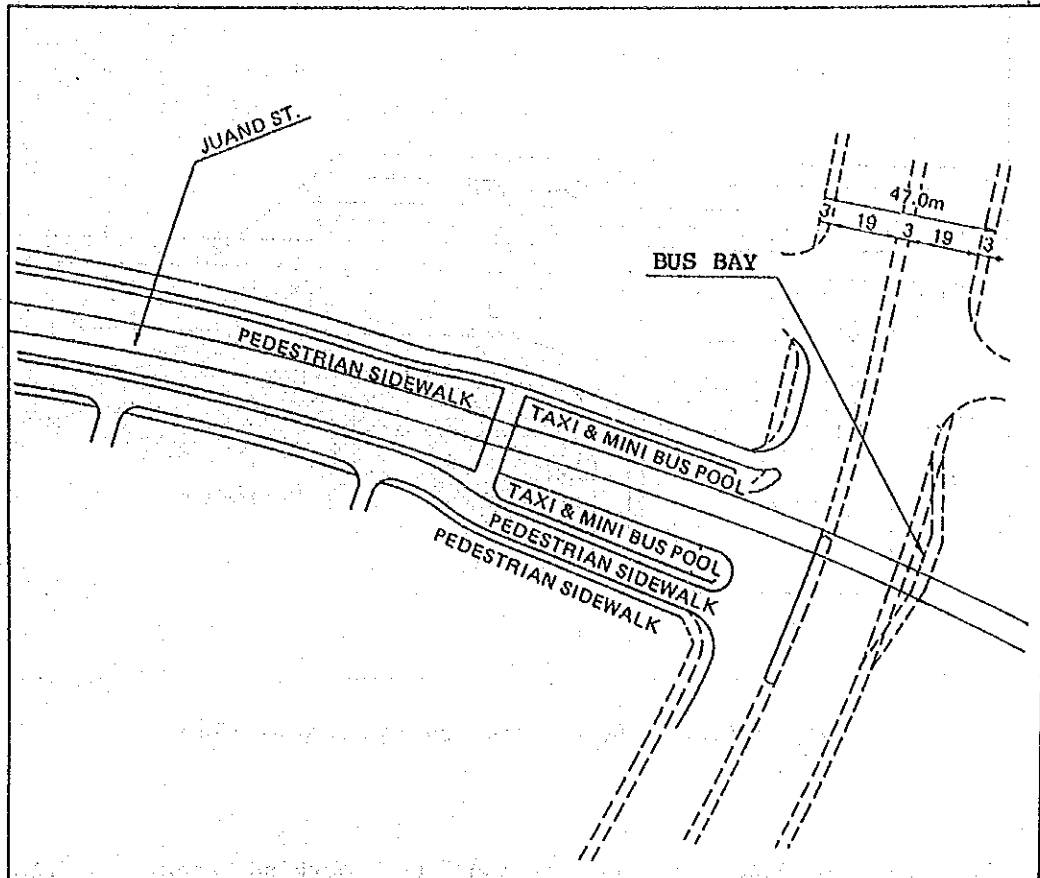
Proposed New Bus Bay on Jl. Juanda
